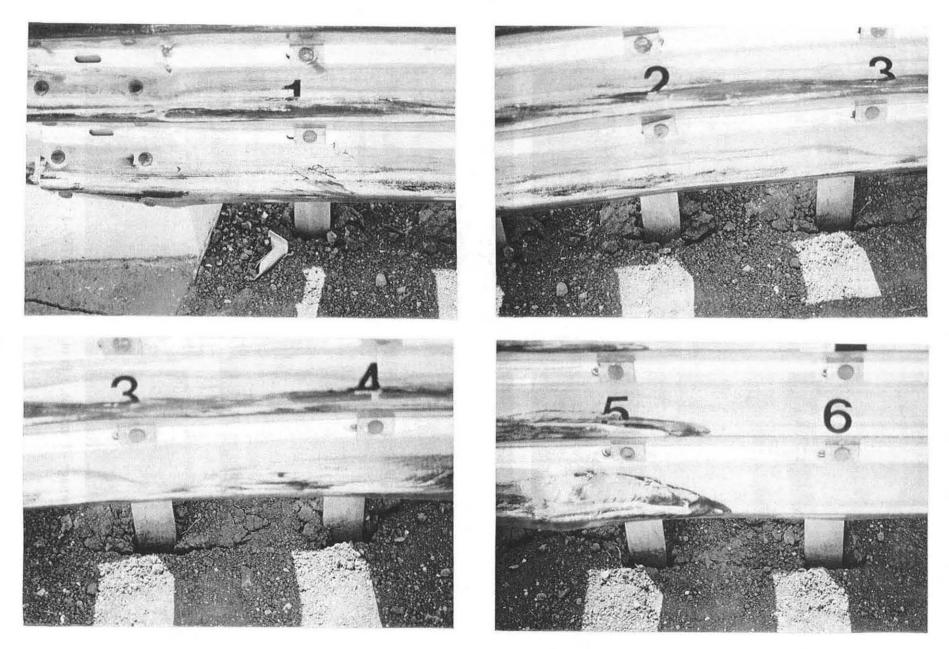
Thrie Beam Damage - Post Nos. 1 through 6, Test MTSS-1
